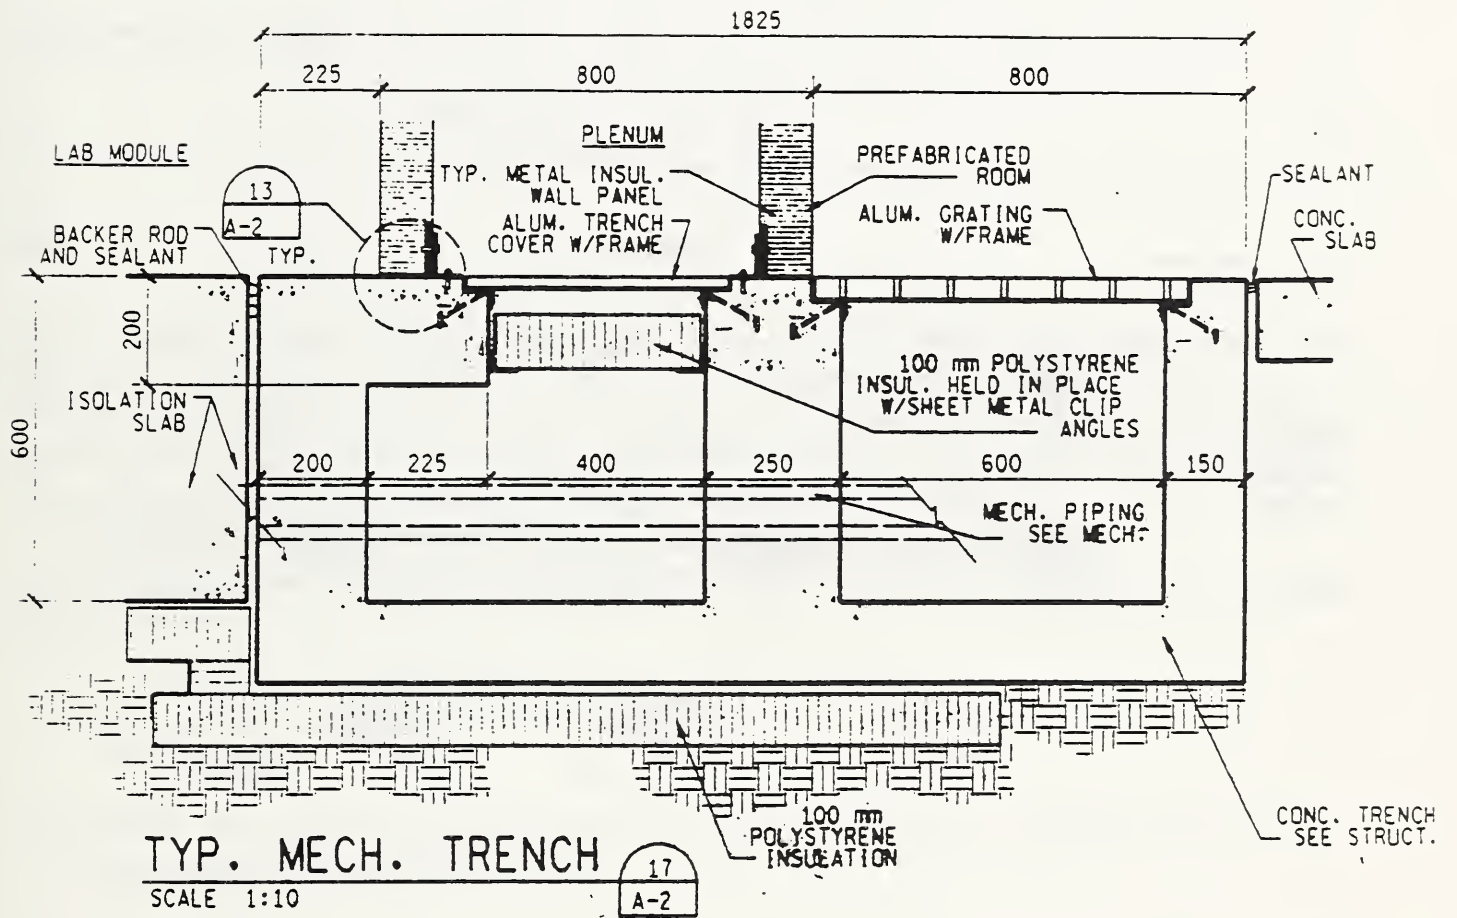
Joint Detail between Isolation Slab and Mechanical Trench
